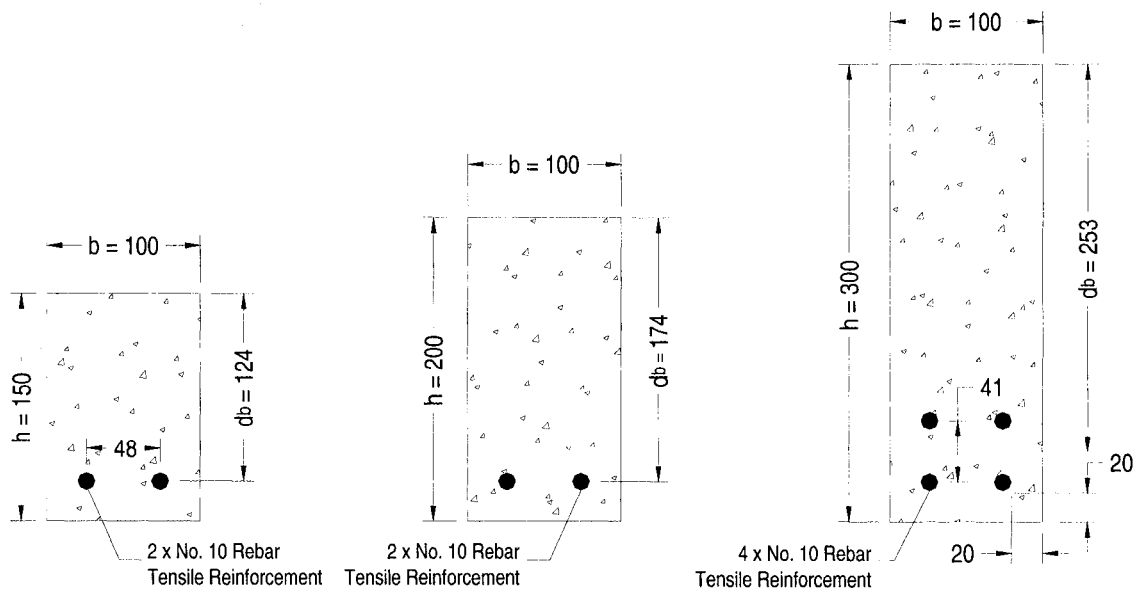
Details of Reinforcement Configuration and Dimensions of the Beams
